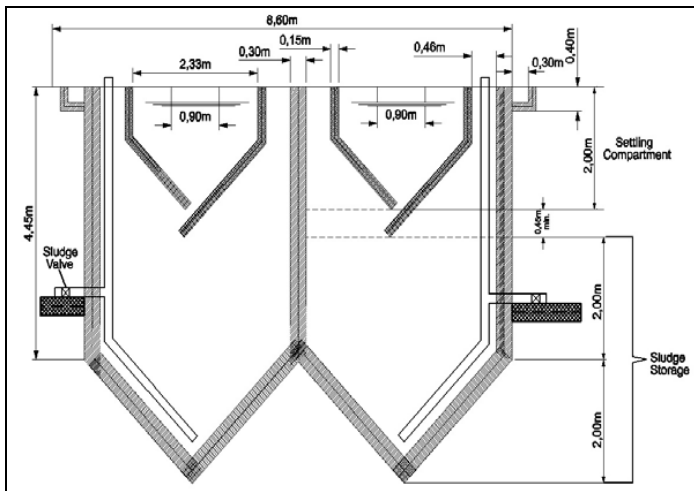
Elevation Cross Section of Las Vegas Imhoff Tanks (Herrera, 2006)
